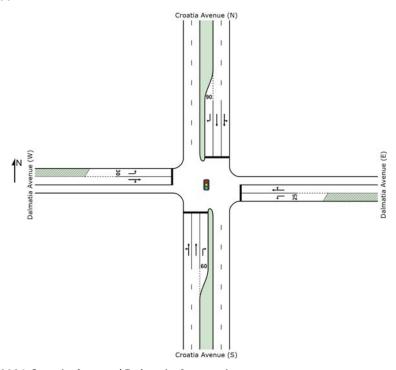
2026 Croatia Avenue/ Dalmatia Avenue Layout
